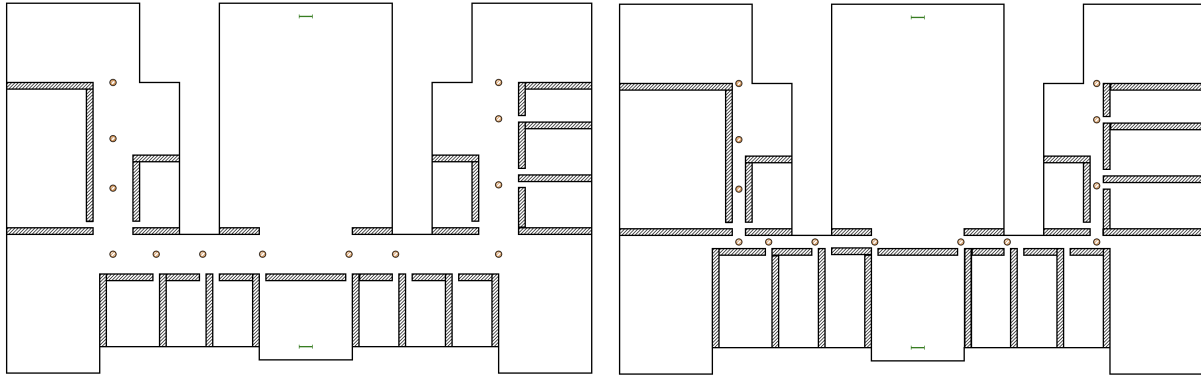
Two floor plans, both with two, two-meter wide exits, straight hallways, and obstacles. The floor plan on the left has six-meter-wide hallways whereas the floor plan on the right has two-meter-wide hallways.
